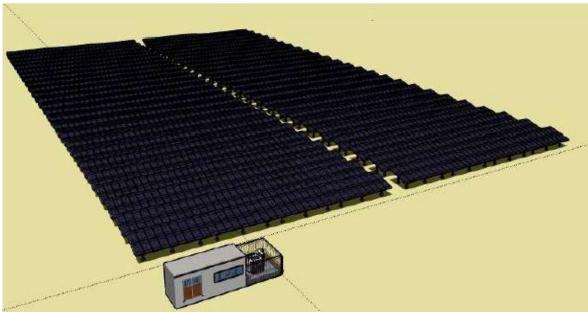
A photovoltaic showing typical layout of the structures (Source: Suntech Power Holdings Co. Ltd.)
